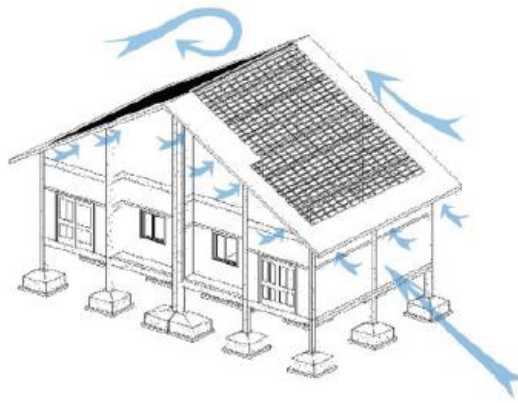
Twin double storey roof & structure (Source: ISET,2013)
